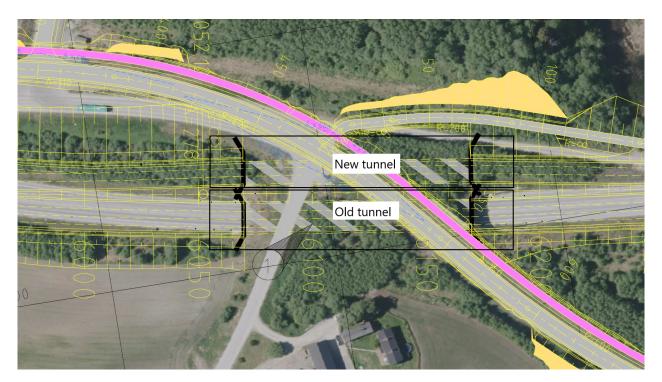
Plan view - New tunnel [Collected from : Nyeveier]
